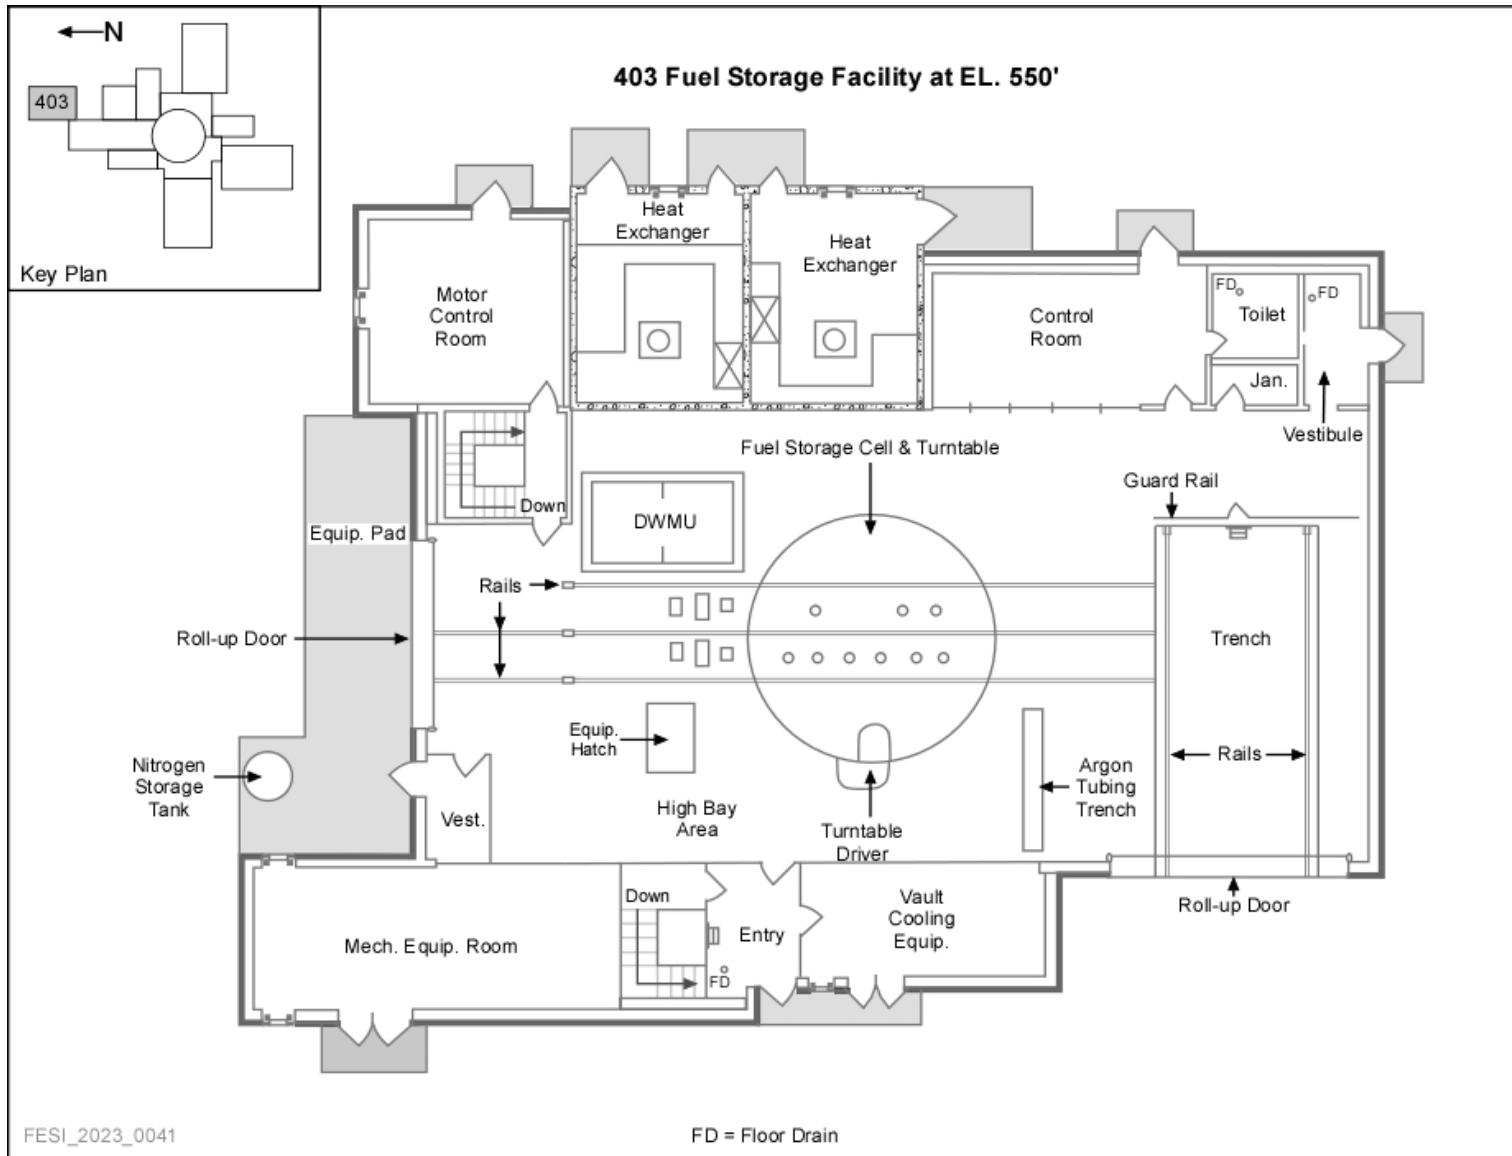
Plan View of 403 Fuel Storage Facility (550 ft Elevation)
